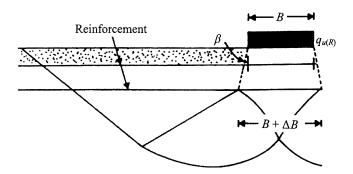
Wide-slab failure mechanism in reinforced sand supporting a strip foundation. [Note: B = width of foundation; $q_{u(R)} =$ ultimate bearing capacity. For definition of ΔB and β , see Eqs. (9)–(11)].
